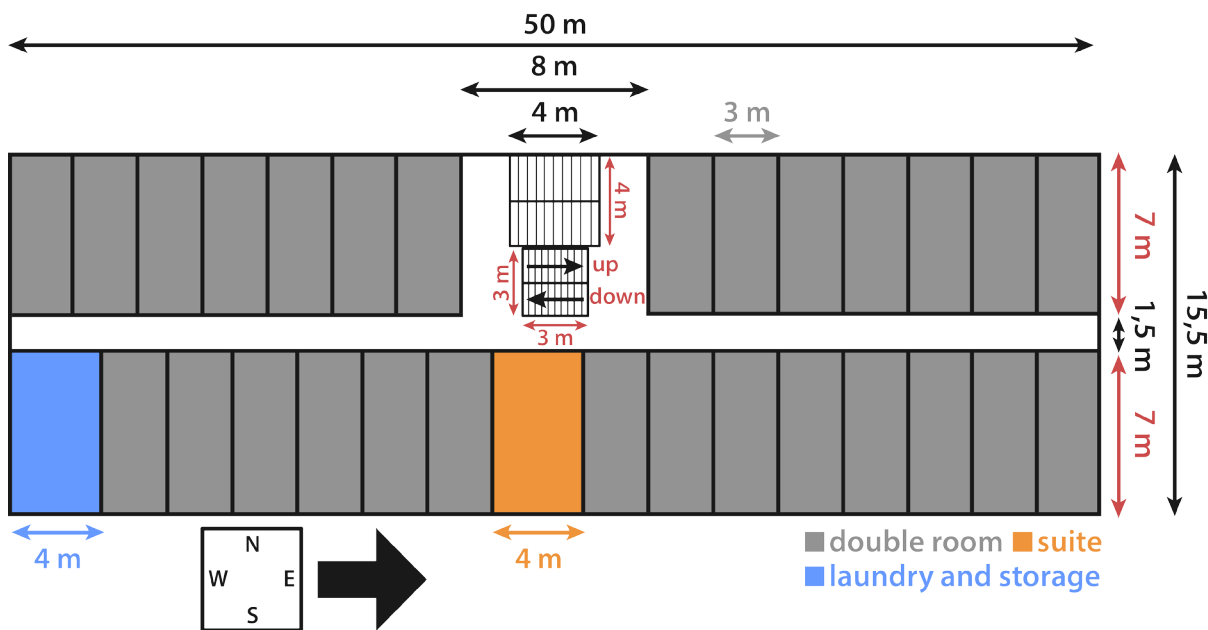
(the floor plan for the second and third levels; stair directions are represented in regard to the upper level (and therefore only on the plan for the second level); note that the 4x4 set of stairs will not be present on the third level and could be replaced by a relaxation area)
